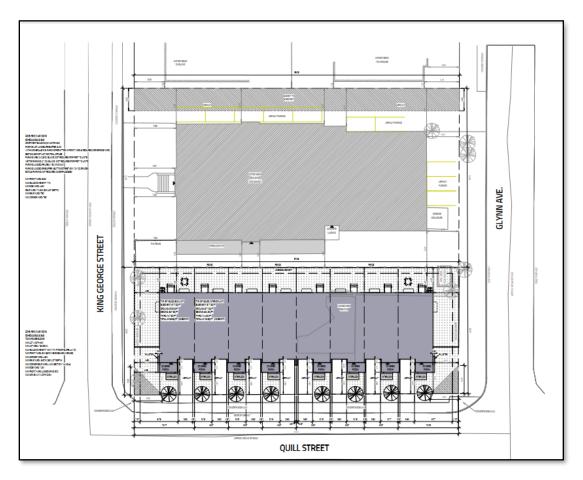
Preliminary site plan for 149 King George Street, with proposed townhome units centered along Quill Street. Source: The Stirling Group, Development Initiatives, August 2023.
